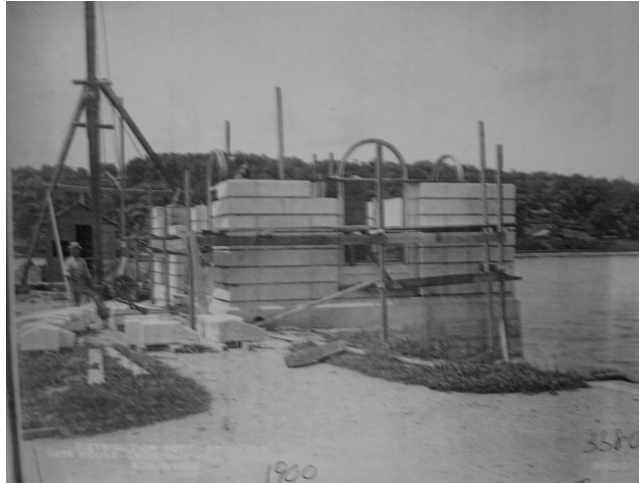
Effluent Gatehouse #2 under construction, 1900 (Massachusetts State Archives).
